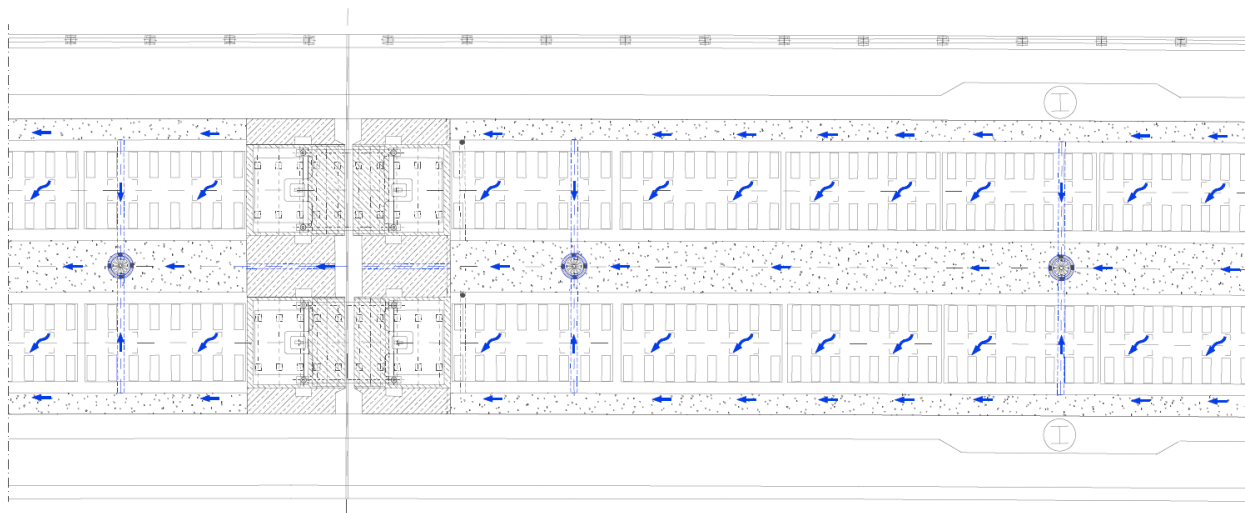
The principle of draining rainwater from a structure with a track on a rigid sub-base
